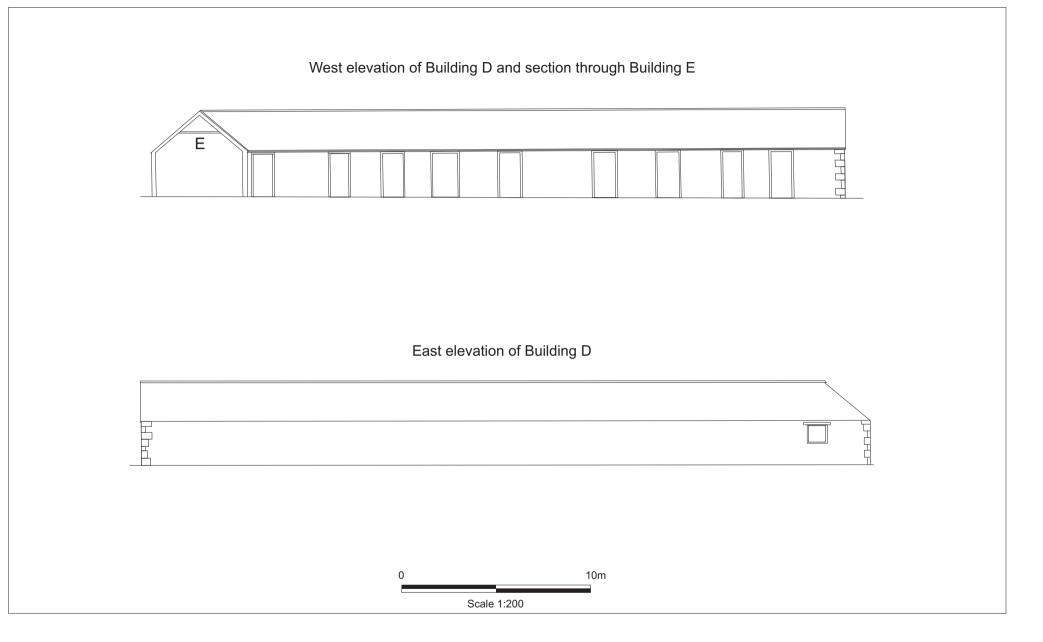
East and west elevations of Building D, and section through Building E at scale 1:200
